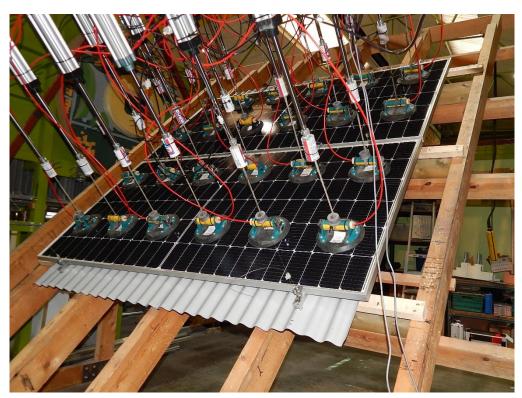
Installation of the Metasole Bracket system on the BRE test rig prior to test.
